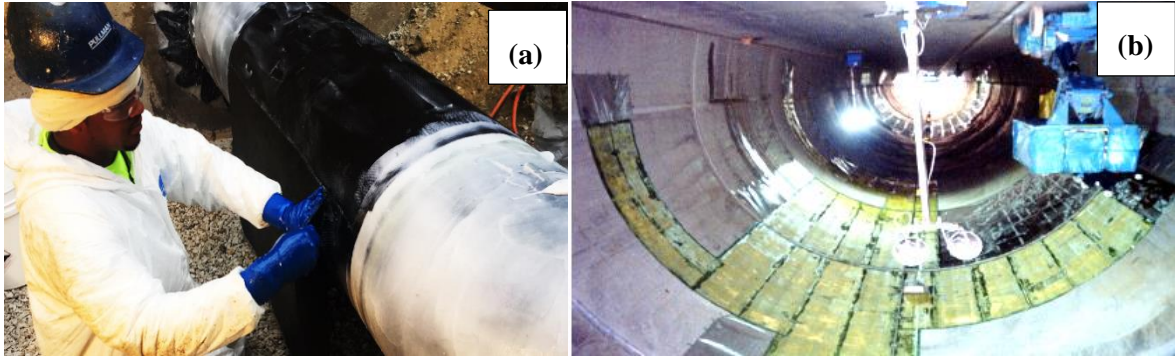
CFRP strengthening of (a) steel pipe line; (b) Tunnel lining
